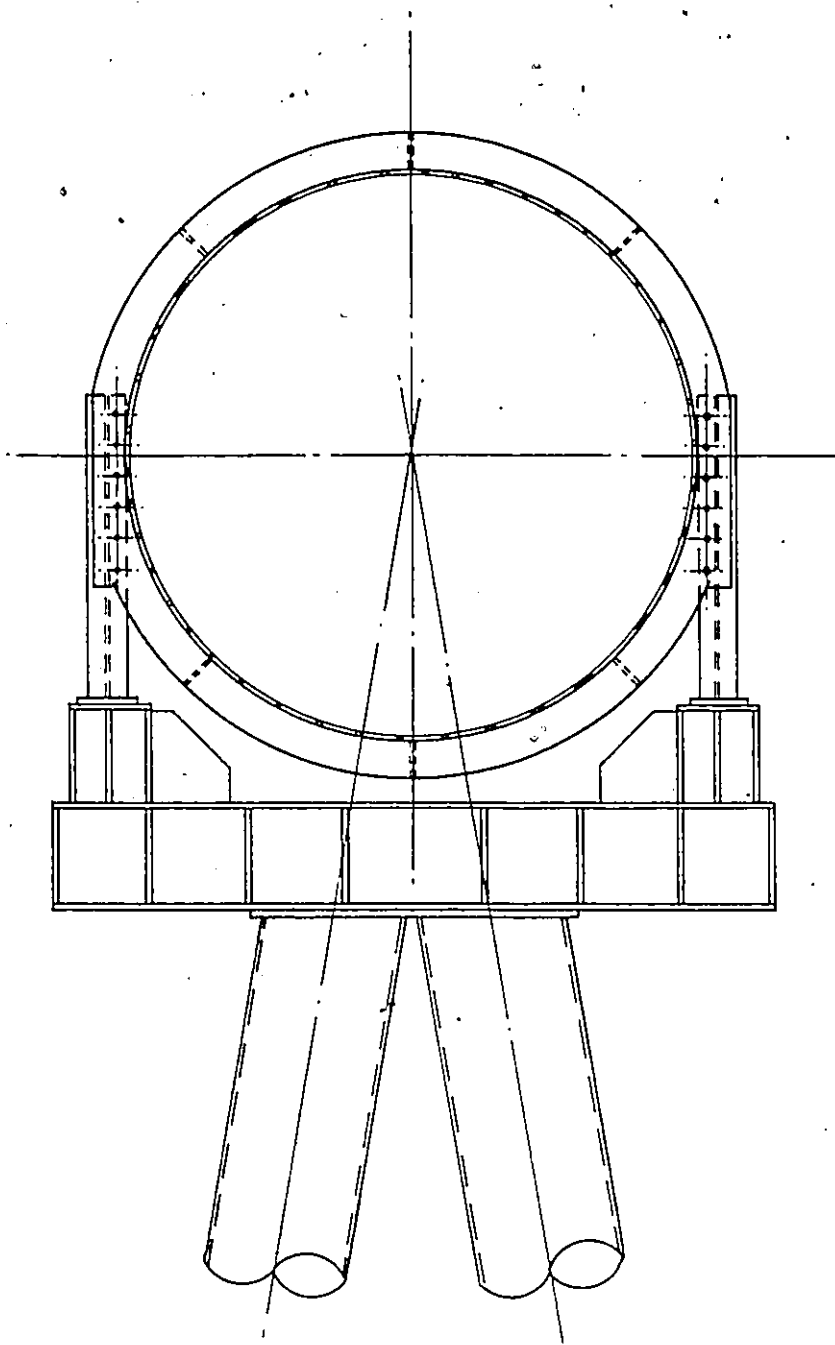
Seat weldment over inverted V-bent
